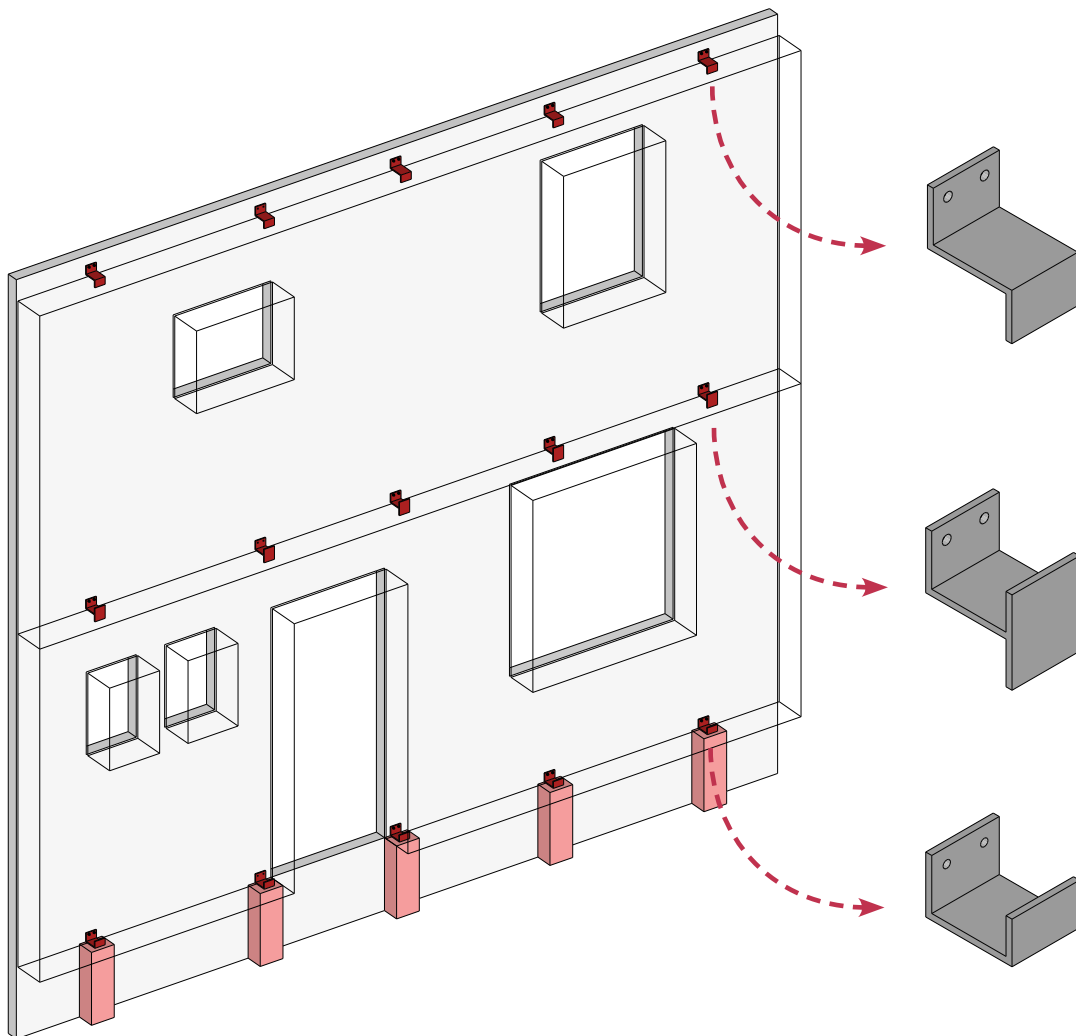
See through image of façade elements and placement of brackets (own image, 2025)
